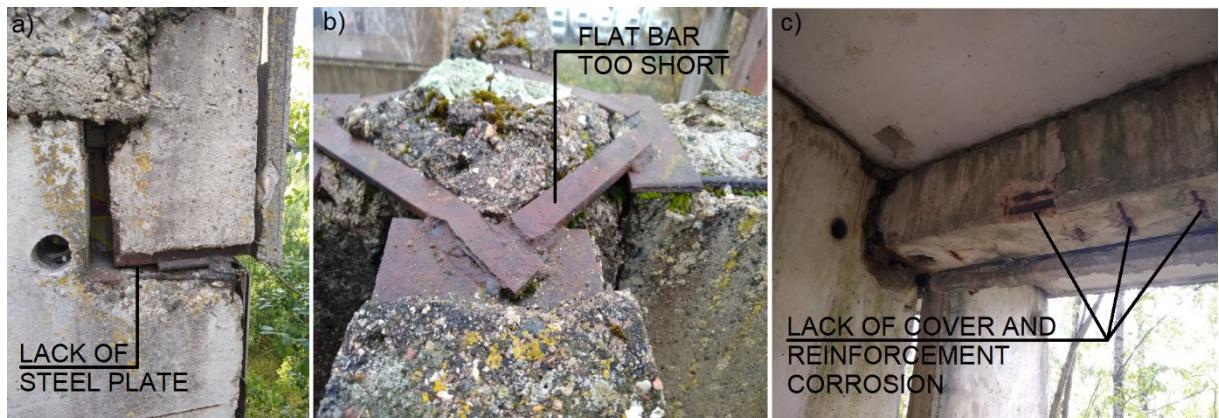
Examples of observed defects: a) lack of plates; b) flat bar and welds too short; c) lack of cover and corrosion of reinforcement
